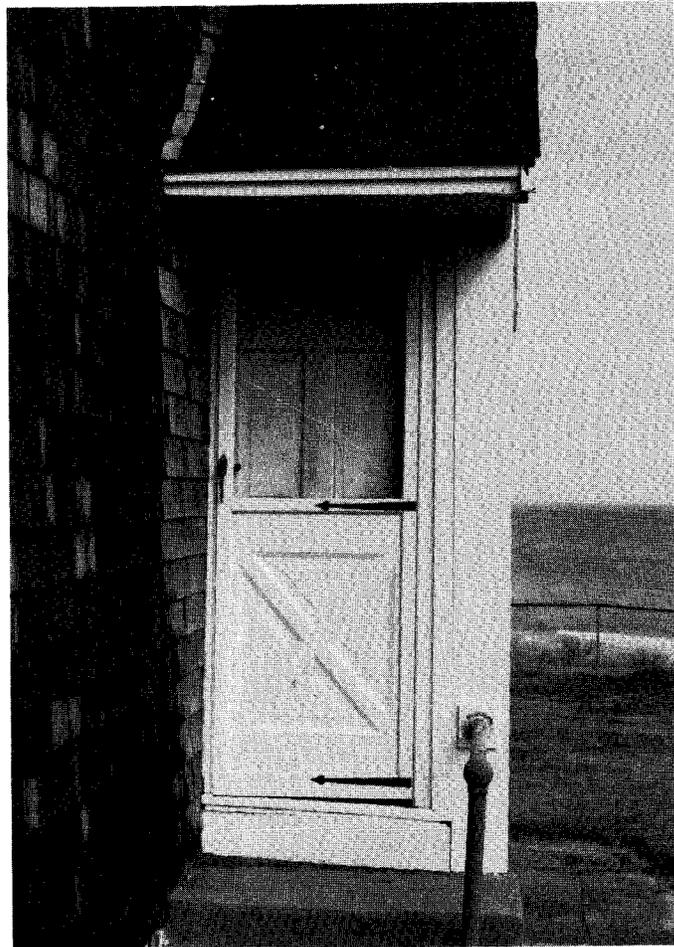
Keeper's Dwelling ell, exterior south doorway of north vestibule.
